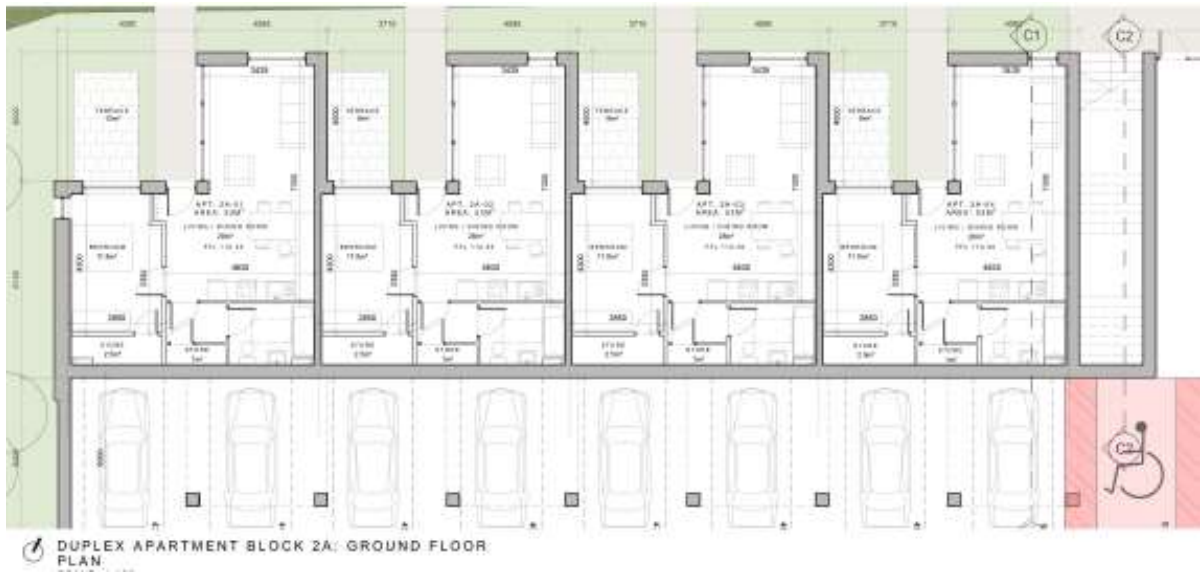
Duplex Apartment Block 2A Ground Floor layout to be analysed using ADF method
